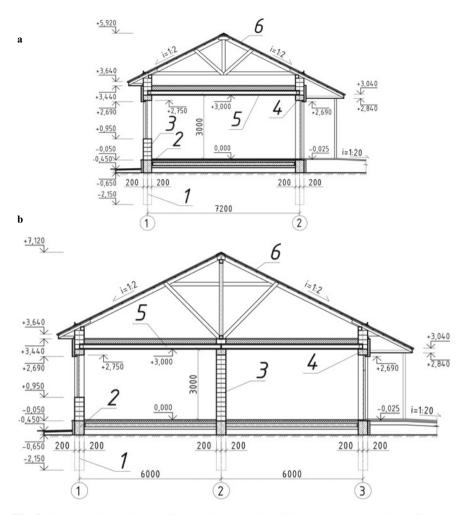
Cross-sectional diagram of a small rural public building (a—one-span scheme, b—twospan scheme): 1—bored and cast-in-place piles; 2—monolithic reinforced concrete grill; 3—walls of aerated concrete blocks 400 mm thick; 4—monolithic reinforced concrete belt under the floor slabs; 5—concrete hollow floor slabs insulated with mineral wool slabs; 6—pitched roof of metal profiled sheets on wooden patches and rafters
